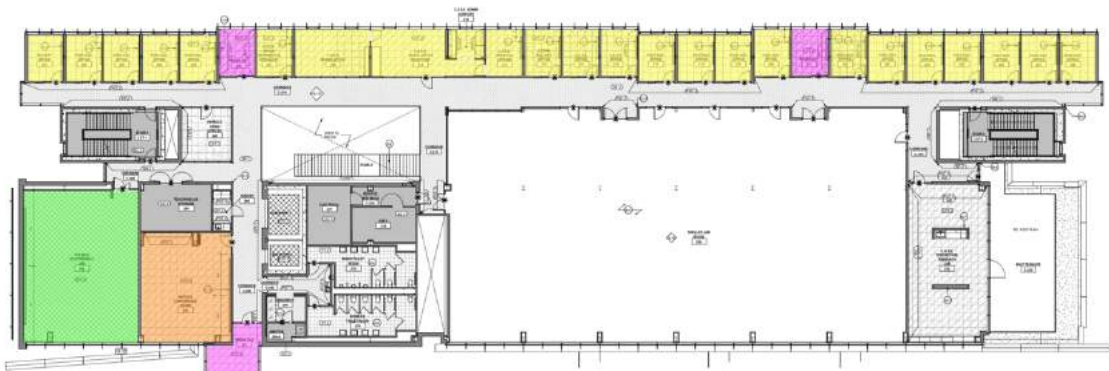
Second floor exterior rooms (Source: Architectural plans)
